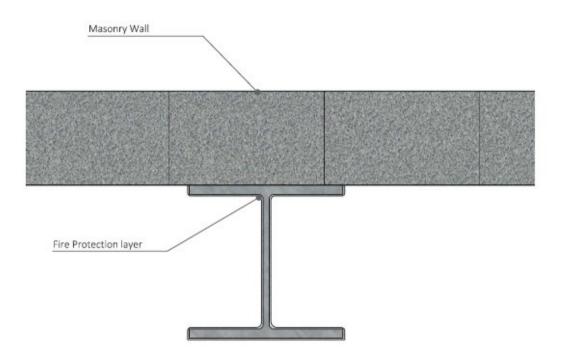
PERLIFOC HP Eco+ or PYROCRETE 60 spray protected steel column interfacing with masonry wall
